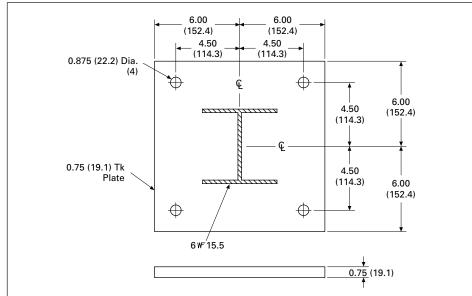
Base Plate Detail (If Eaton Provides Column Support)
